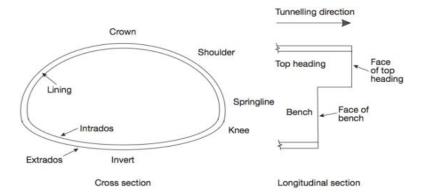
Cross section and longitudinal section of tunnel heading [12]
